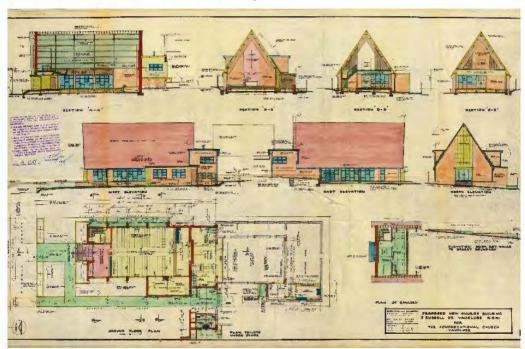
Original plans by Booker & Wilson for the 1960 A-frame church building (Source: Woollahra Council records)
